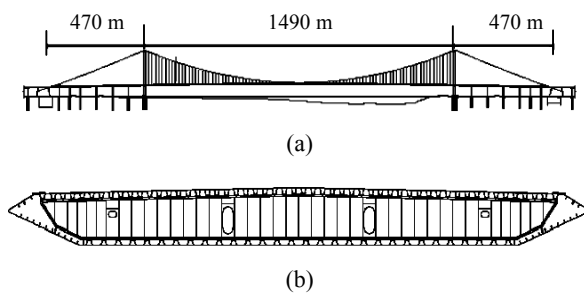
General layout of the Runrang Bridge. (a) Elevation; (b) Cross-section of the stiffening girder
